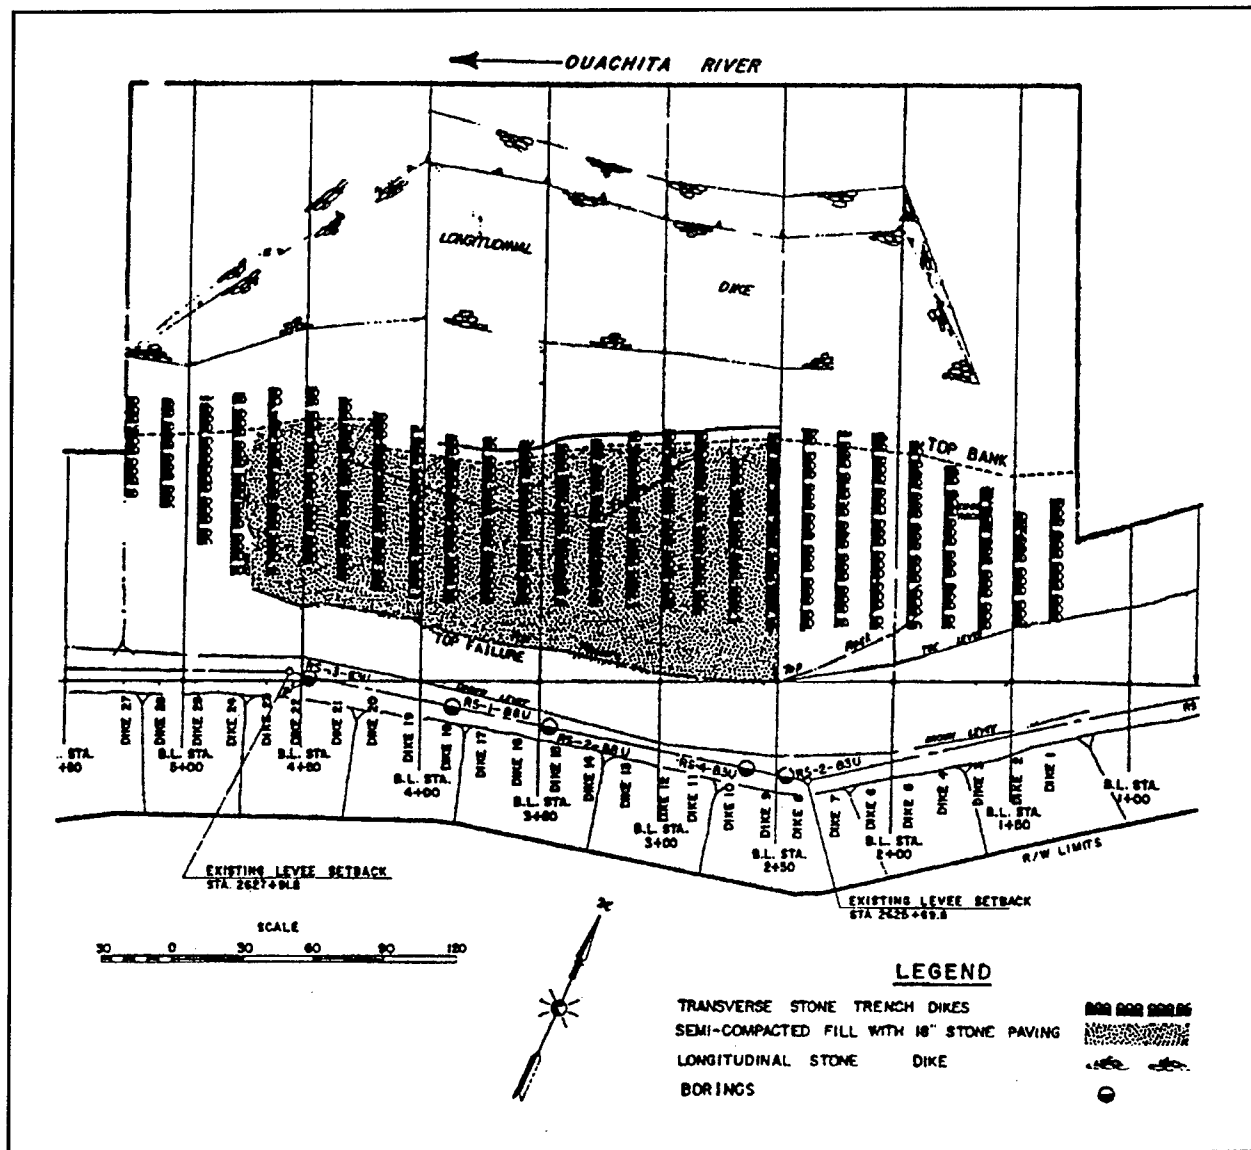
Site plan of stone-fill trenches used to stabilize levee on the Ouachita River at Rilla, LA, by USAED, Vicksburg, in 1988 (from Sills and Fleming 1994)
